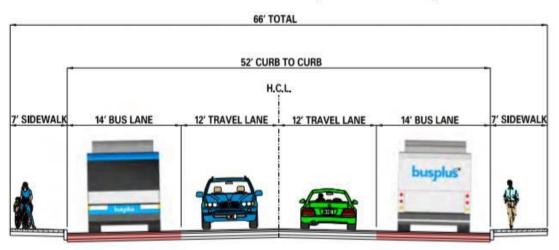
River Corridor Alternative 2 – Broadway (NYS 32) between Clinton Avenue and 1st Street
